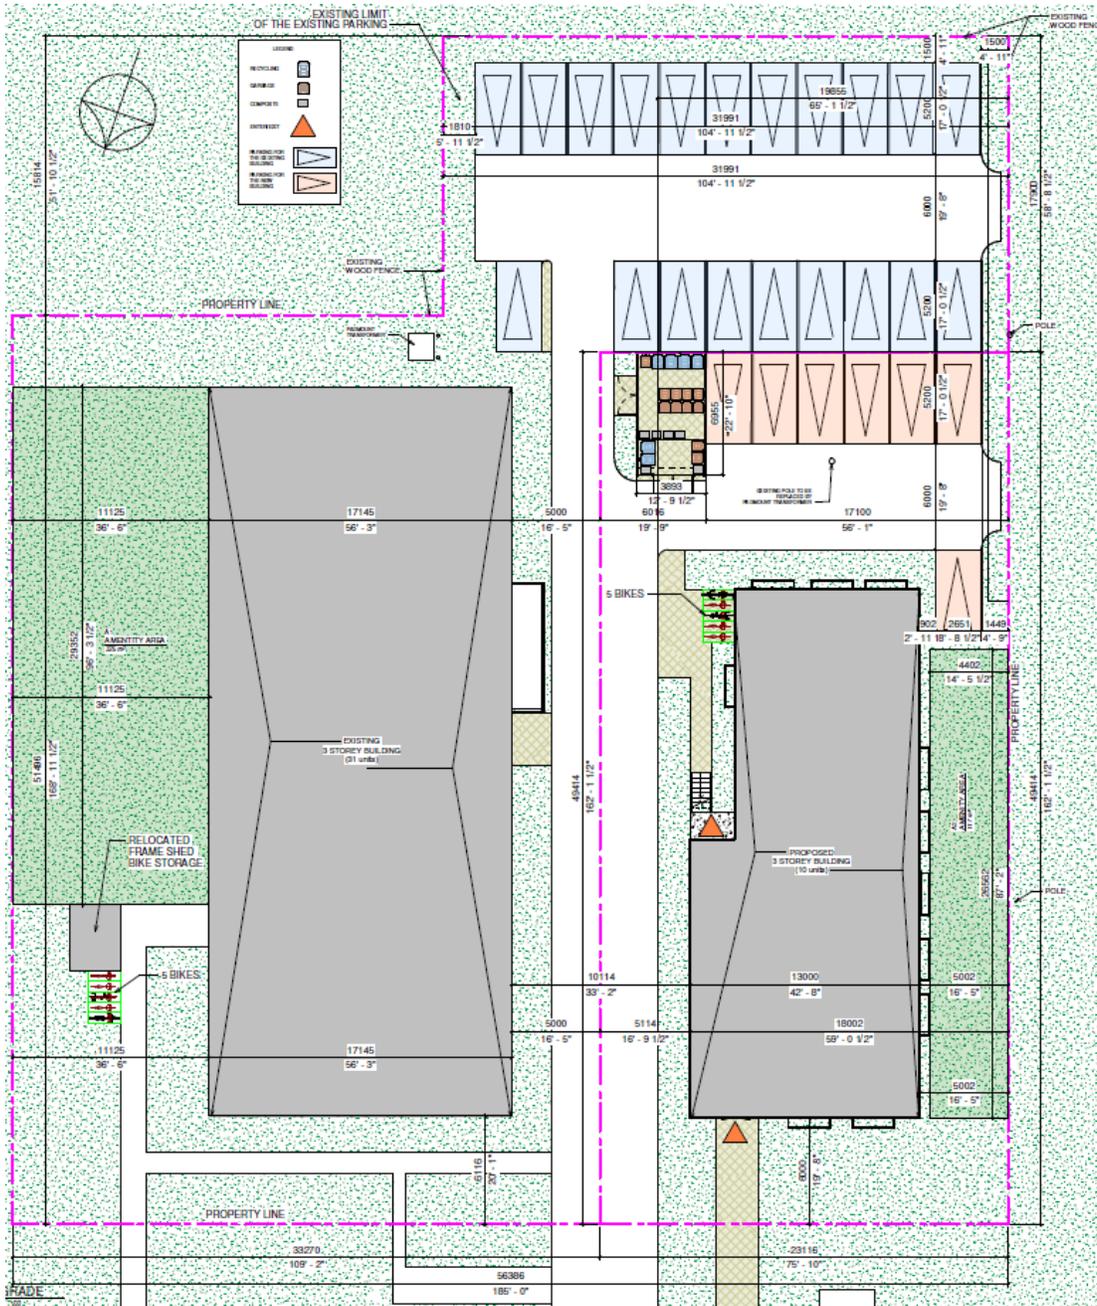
Preliminary Site Plan illustrating the existing/proposed buildings and associated parking
